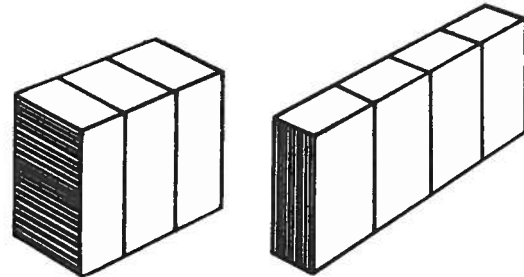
8: Soldier course; (left) side-to-side; (right) end-to-end.
